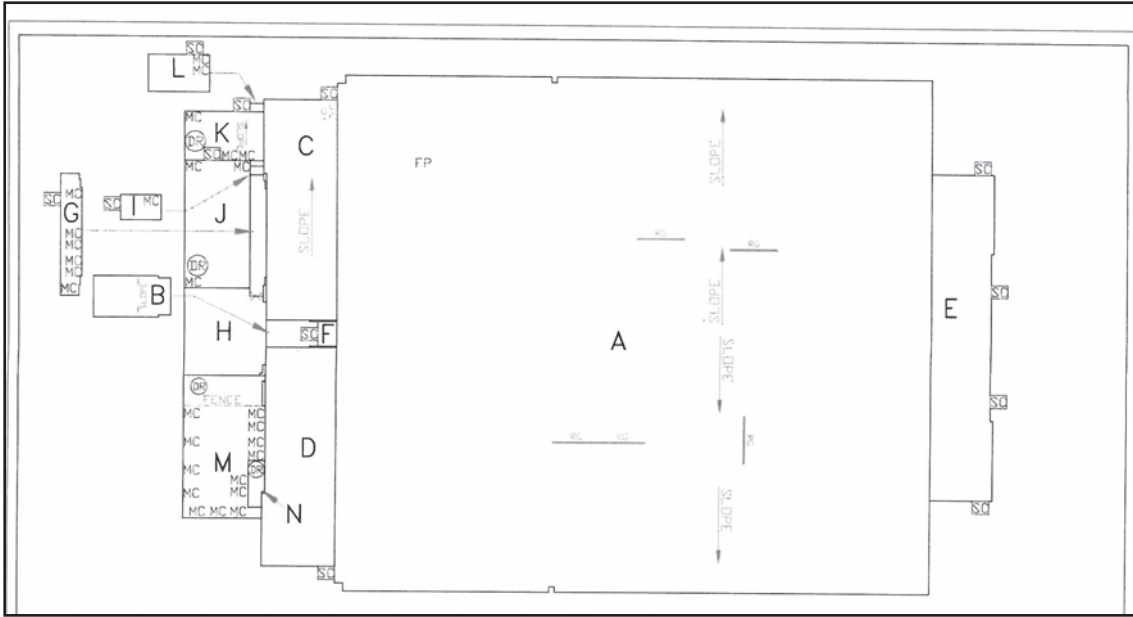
Roof Plan indicating Roof Area A to be re-roofed.
